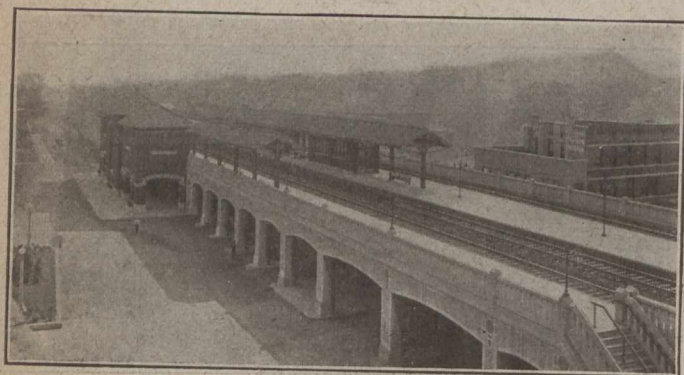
Flat-Slab Bridge Carrying Lackawanna at South Orange Station
